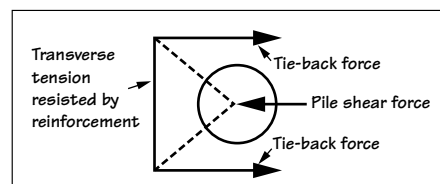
Spread of load from a pile to adjacent tie bars^[7]
